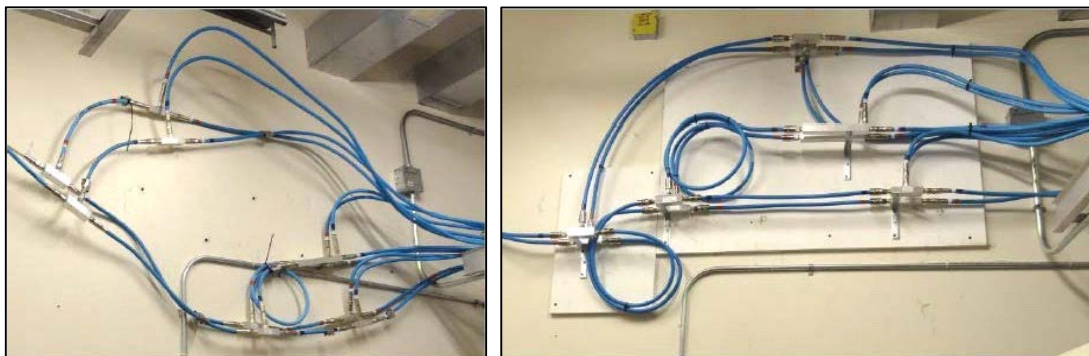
Initial and Improved Installation to Reduce Stress on RF Connections and Improve Testability
